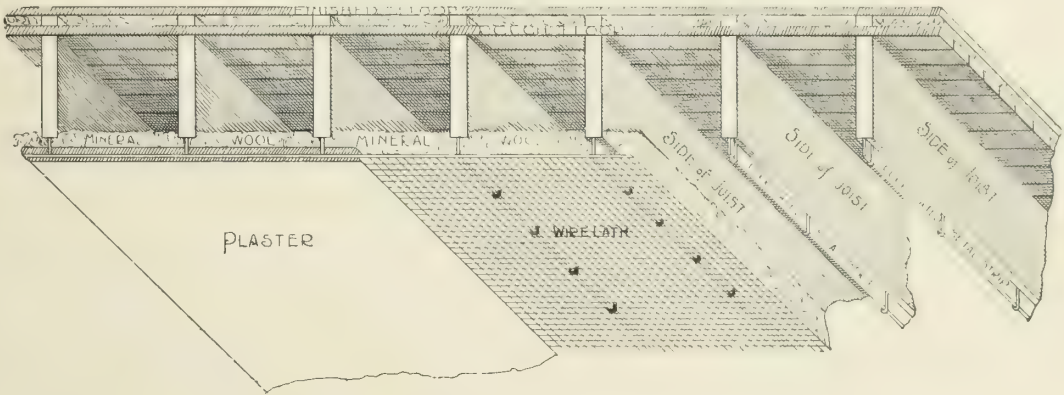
Semi-Fireproof Construction for Ceilings Partition
